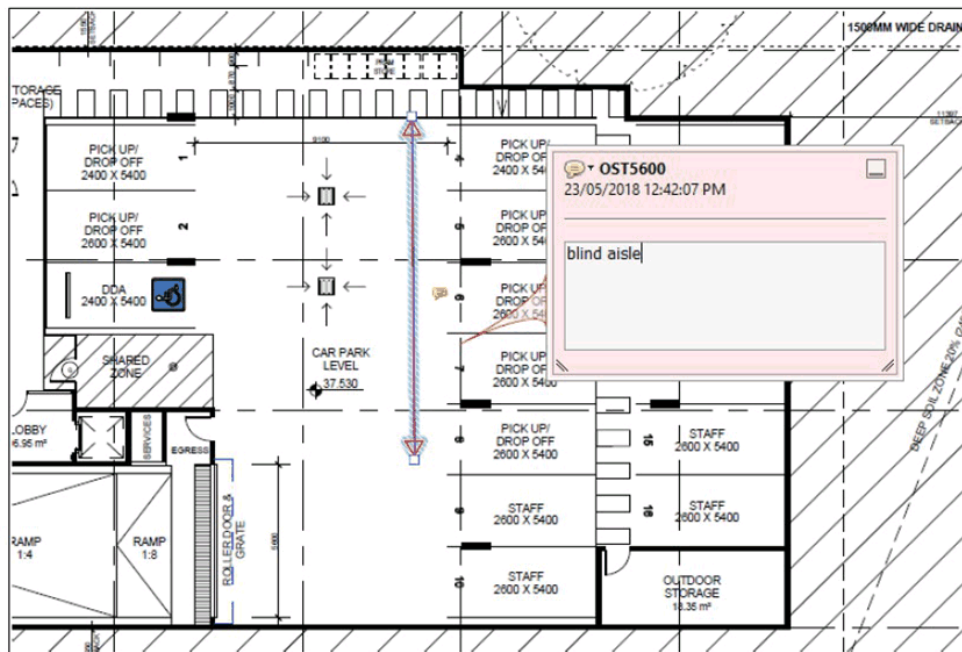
Basement level design and blind aisle length (source: Traffic Assessment Report, TEF Consulting).
